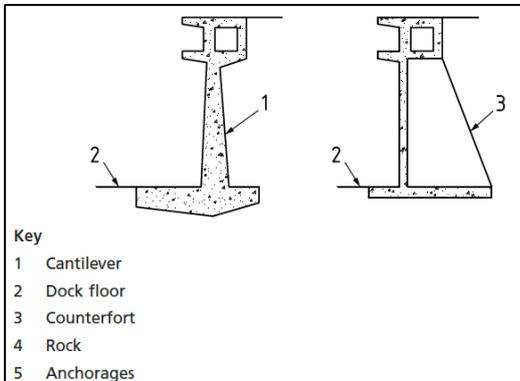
L-Shaped walls; left cantilever; right counterfort
